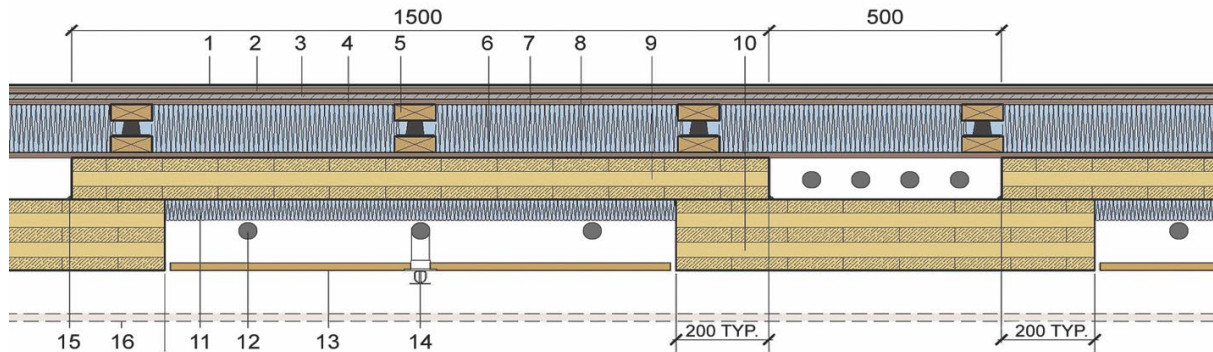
An example of a slab assembly from the Wood Innovation and Design Centre (courtesy of MGA | Michael Green Architecture).
